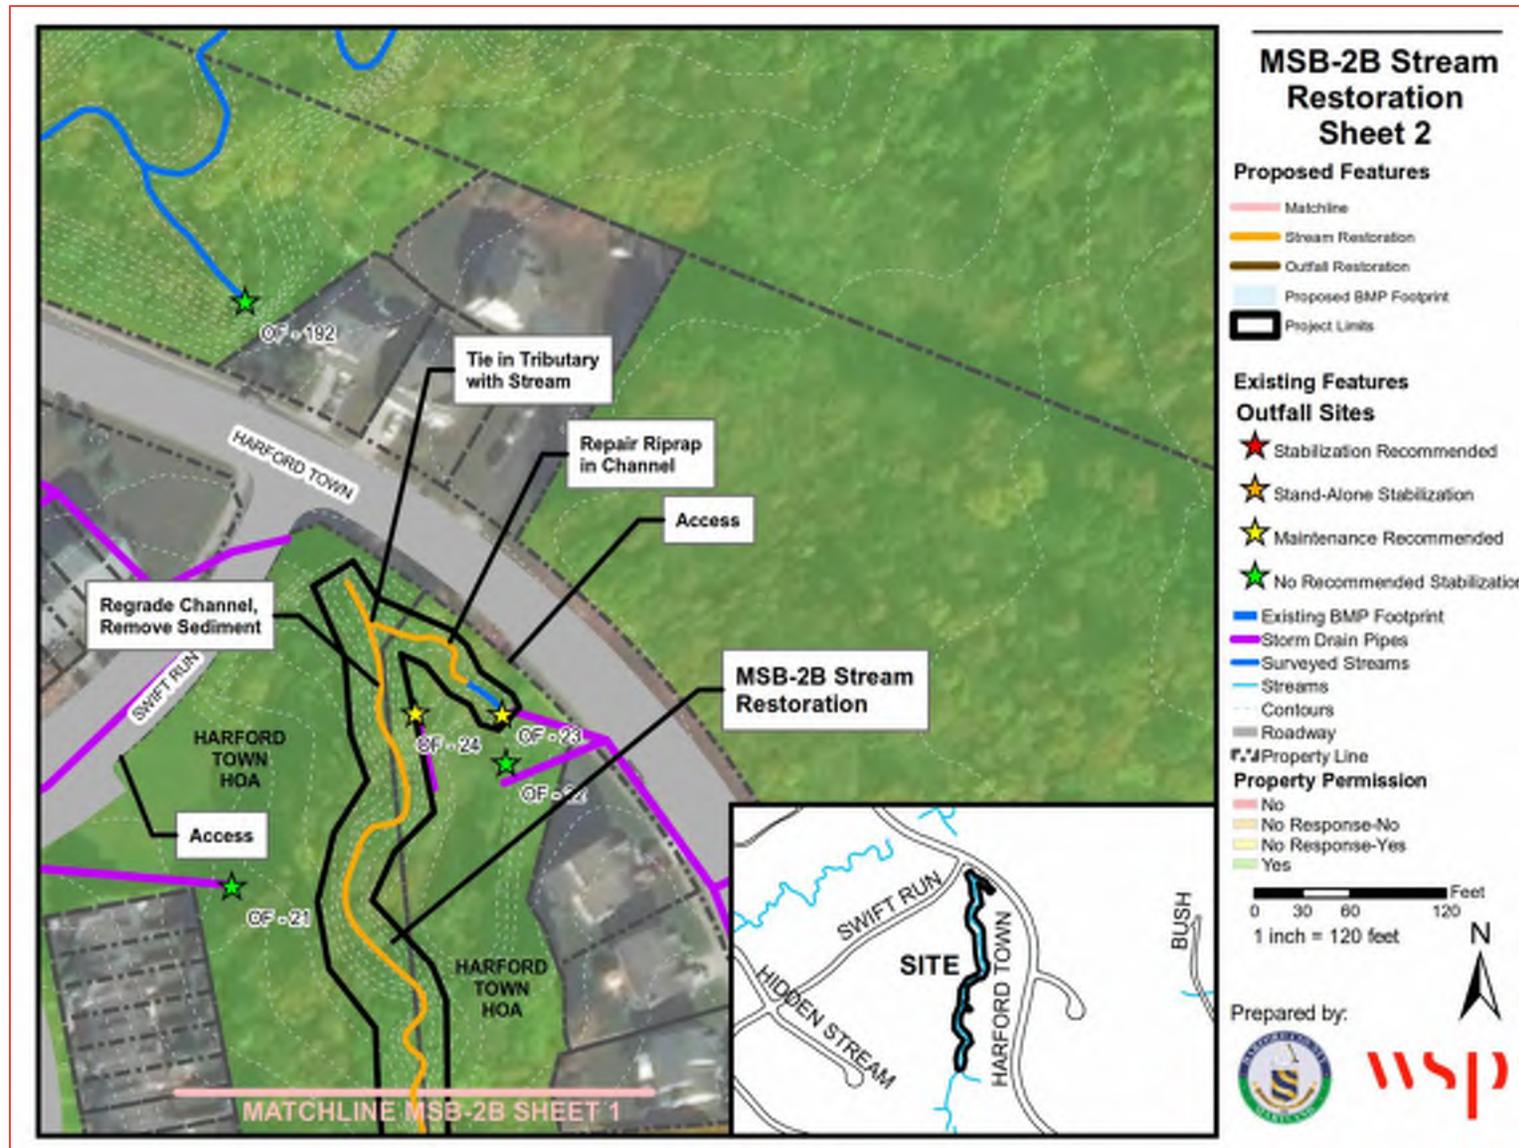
Site Location and Proposed Project Plan for MSB-2B Stream Restoration (Sheet 2 of 2)
